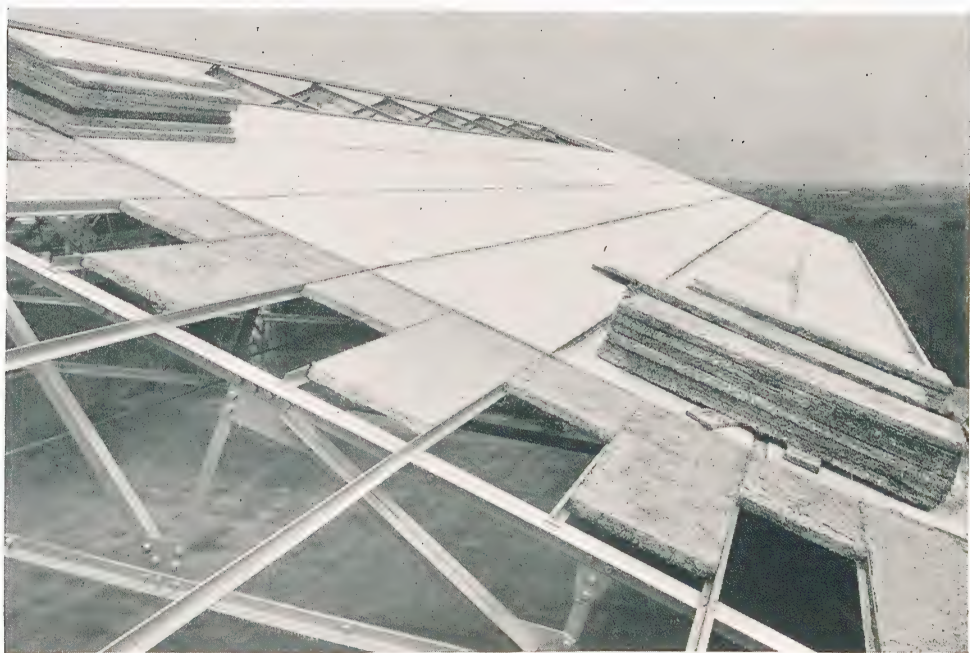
ROOF CONSTRUCTION WITH GYPKLITH LIGHT-WEIGHT BUILDING SLABS.
